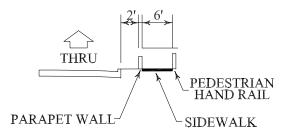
Bridge Parapet Wall and Pedestrian Rail
